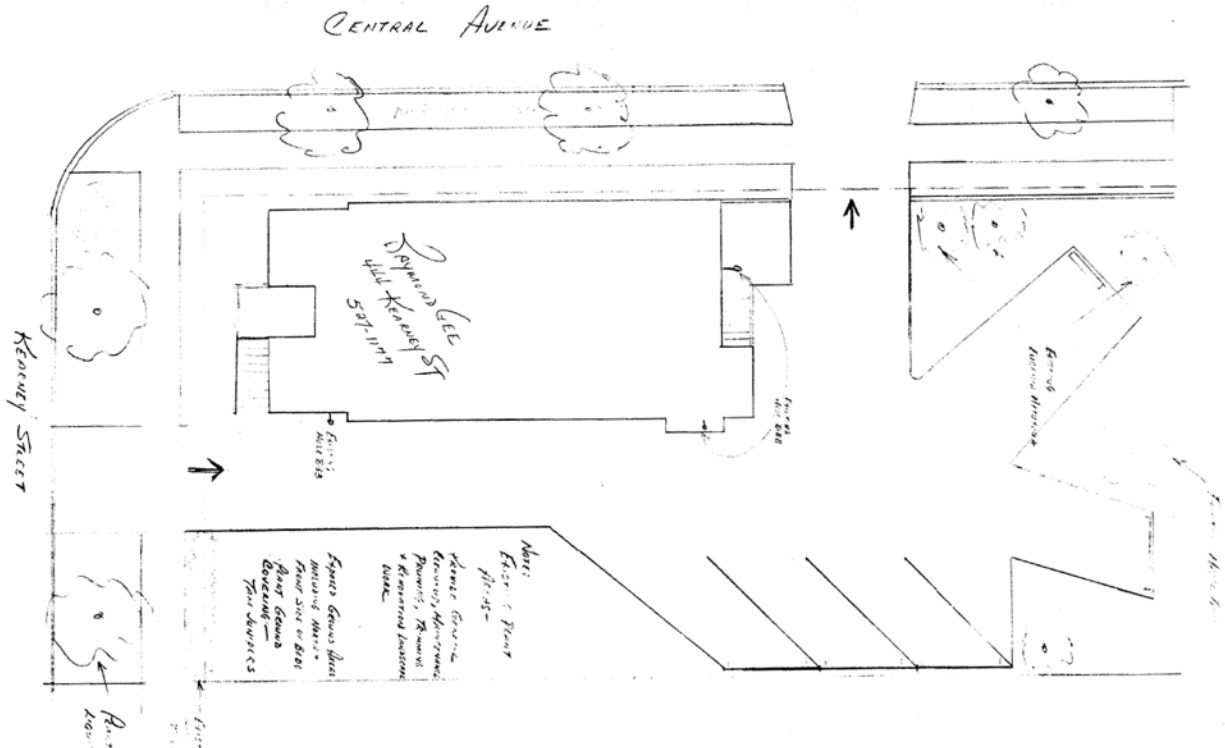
A 1976 site plan showing the residence and proposed parking configuration (El Cerrito Building Division).
